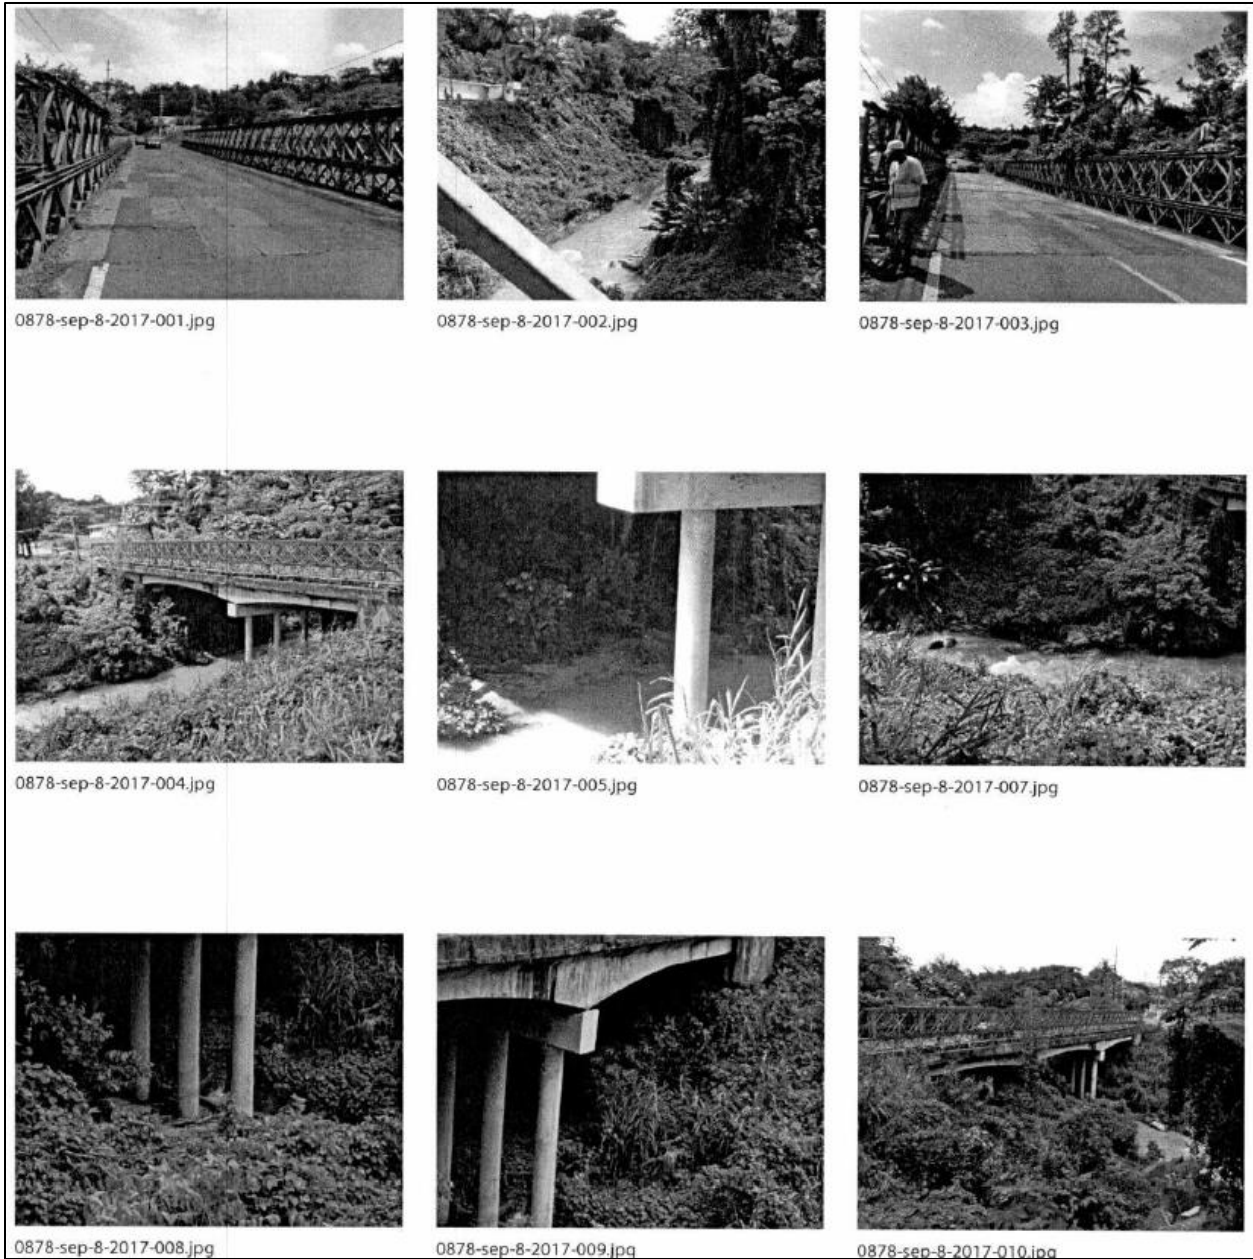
Bridge 878 photos from September 8, 2017 inspection (source: PRHTA)
